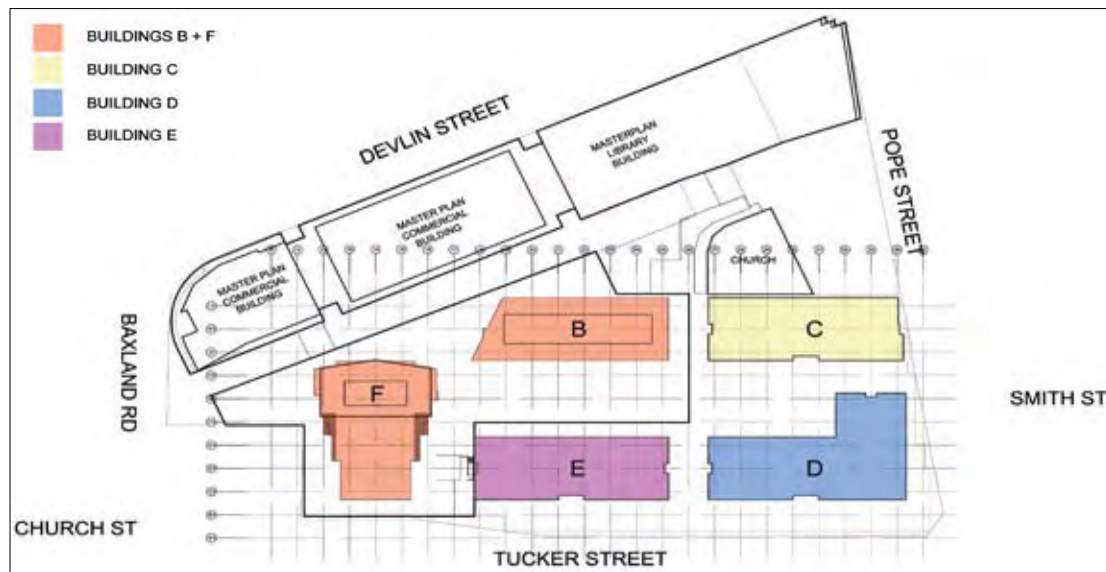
Perimeter Arrangement for Buildings B, C, D, E and F
